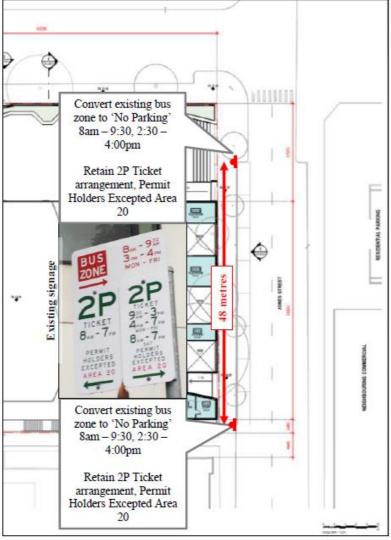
On-Street Parking Adjustments 1 (Arup)
